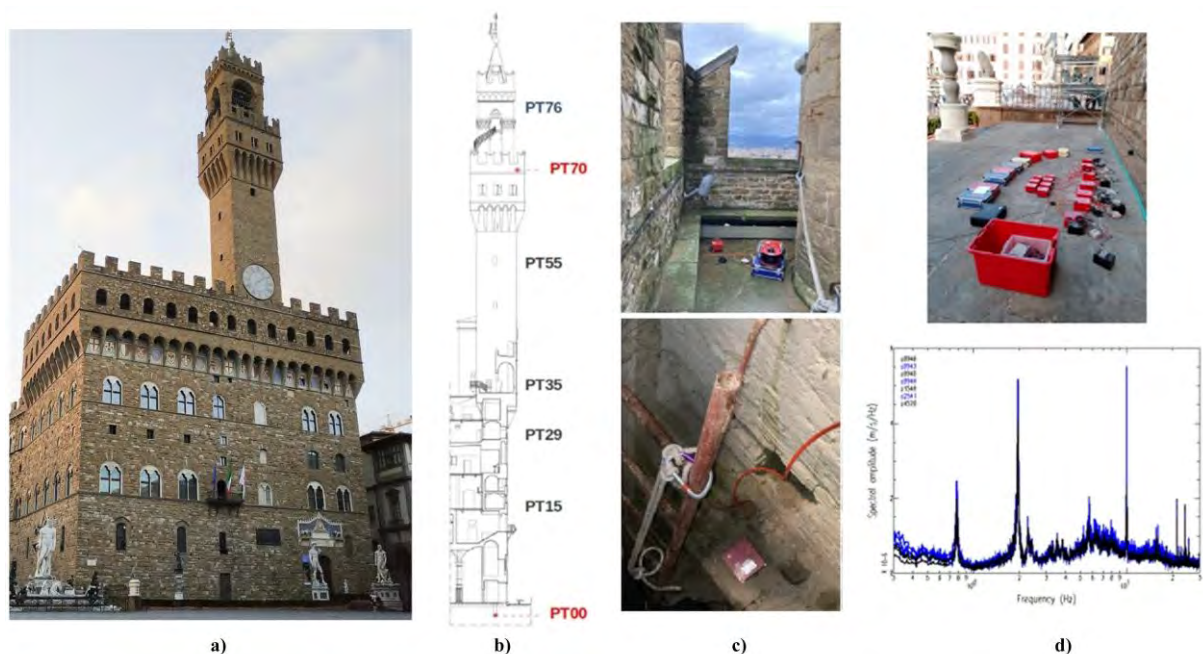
a) Palazzo Vecchio and Arnolfo Tower; b) Location of the seismic station along the Tower; c) examples of installation, terrace station (PT70 top figure) and one of the stations inside the Palazzo (PT00 bottom); d) Huddle Test, installation and comparison of the spectra recorded by all the seismic stations.
